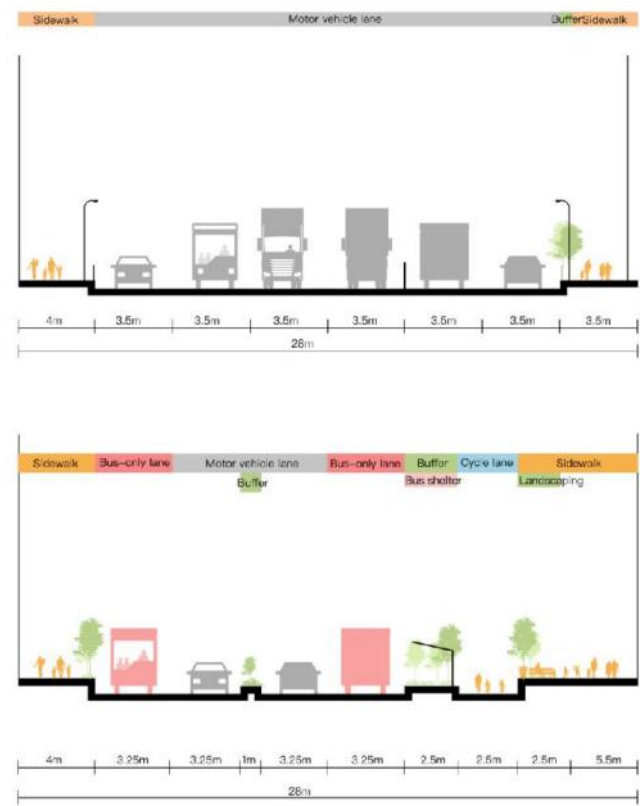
Original section and renewal section of Xiaobei Road (Drawn by author)
